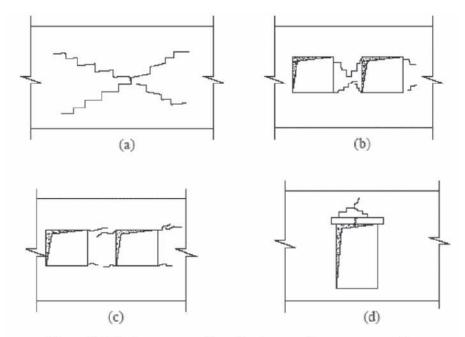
Various types of cracks observed in masonry walls
